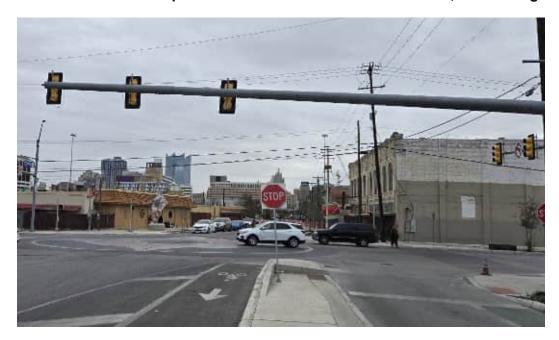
View from Buena Vista and South Trinity Street intersection towards area of above-ground construction within the Buena Vista Historic District; view facing southeast.
